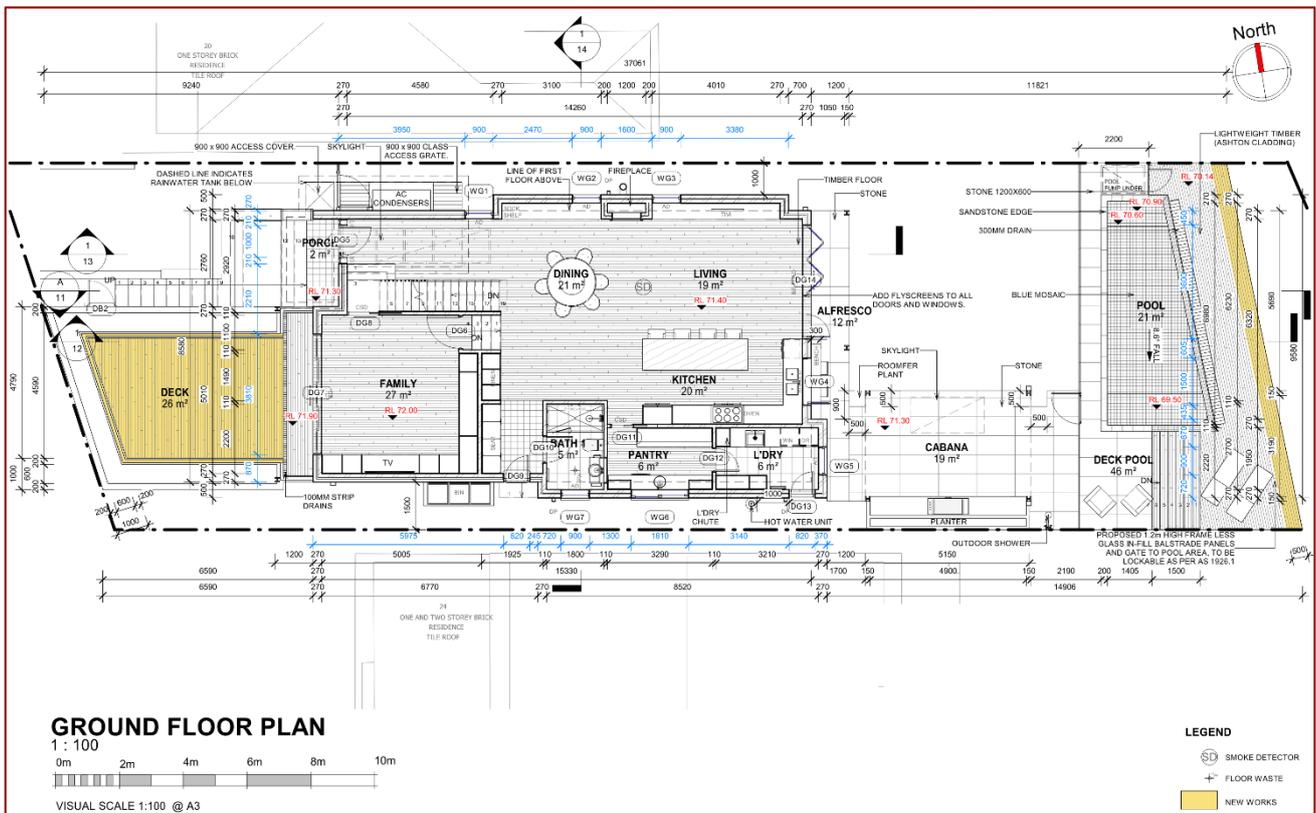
BASIX sample Detached dwelling Ground Floor Plan
